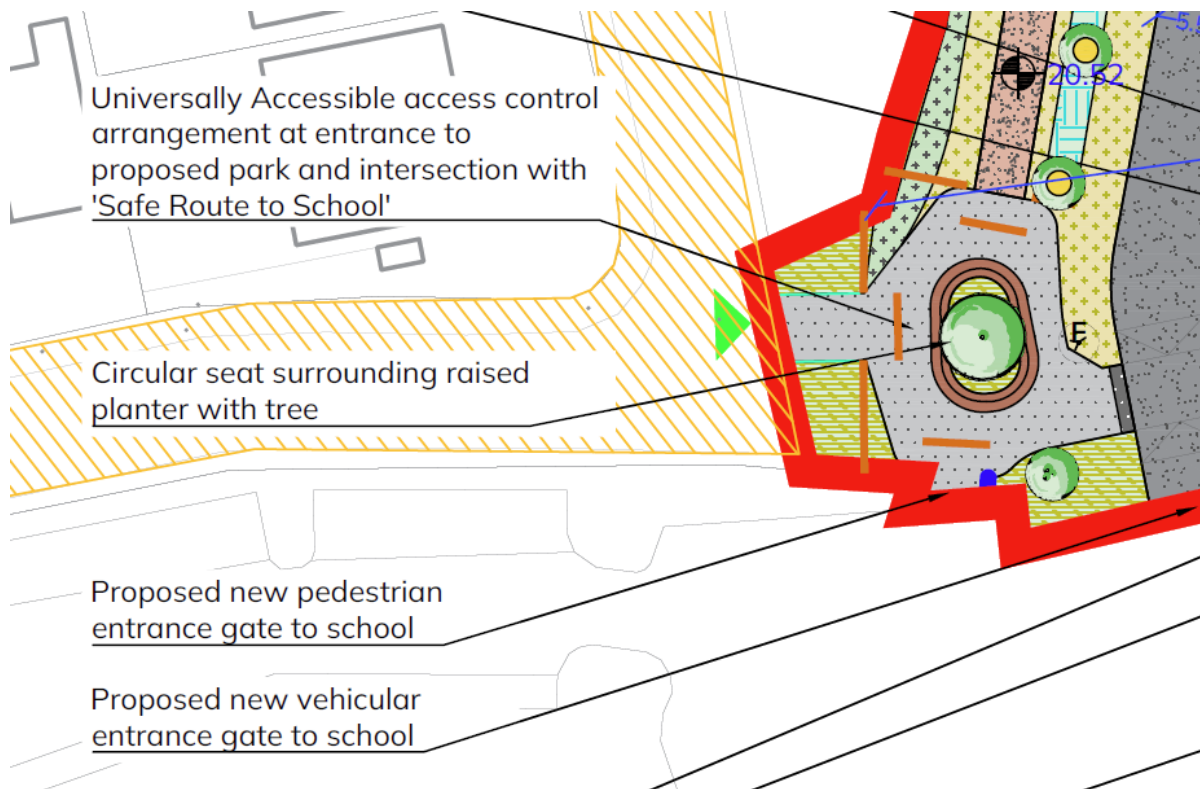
Western Gateway Oval detail from proposed Site Layout Plan of Kingston Park (Drawing P612-KIN-LD-GA-101)
